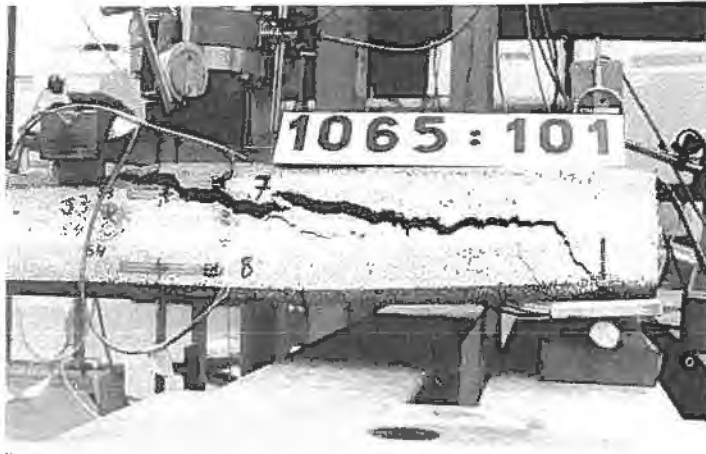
Shear crack in slab 101 with a long shear span
